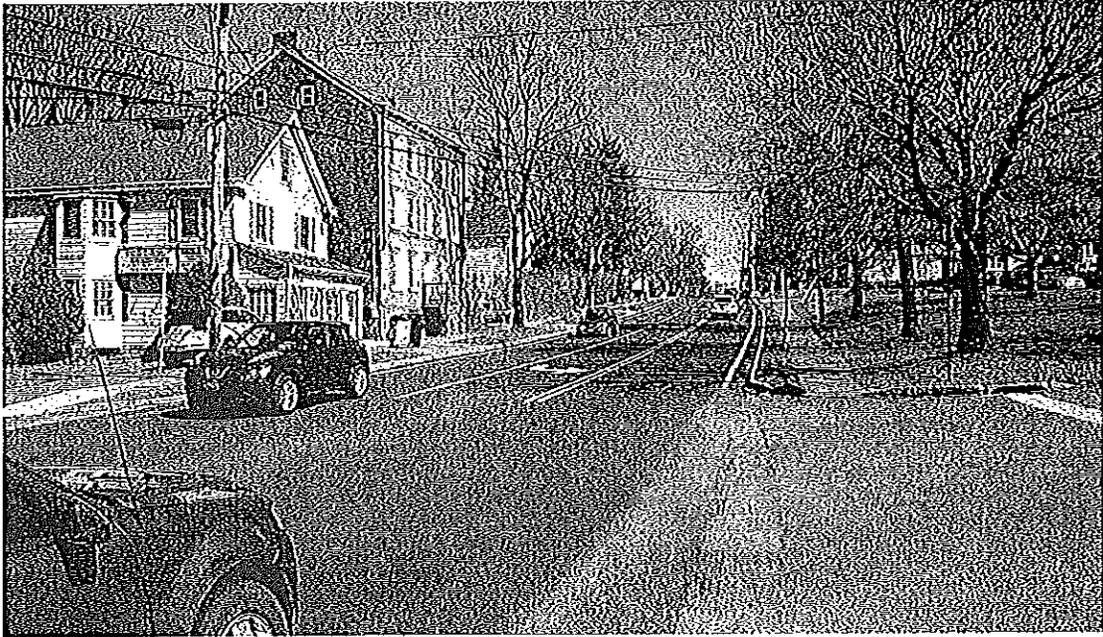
Leroy Place @ Grand Street looking southeast
